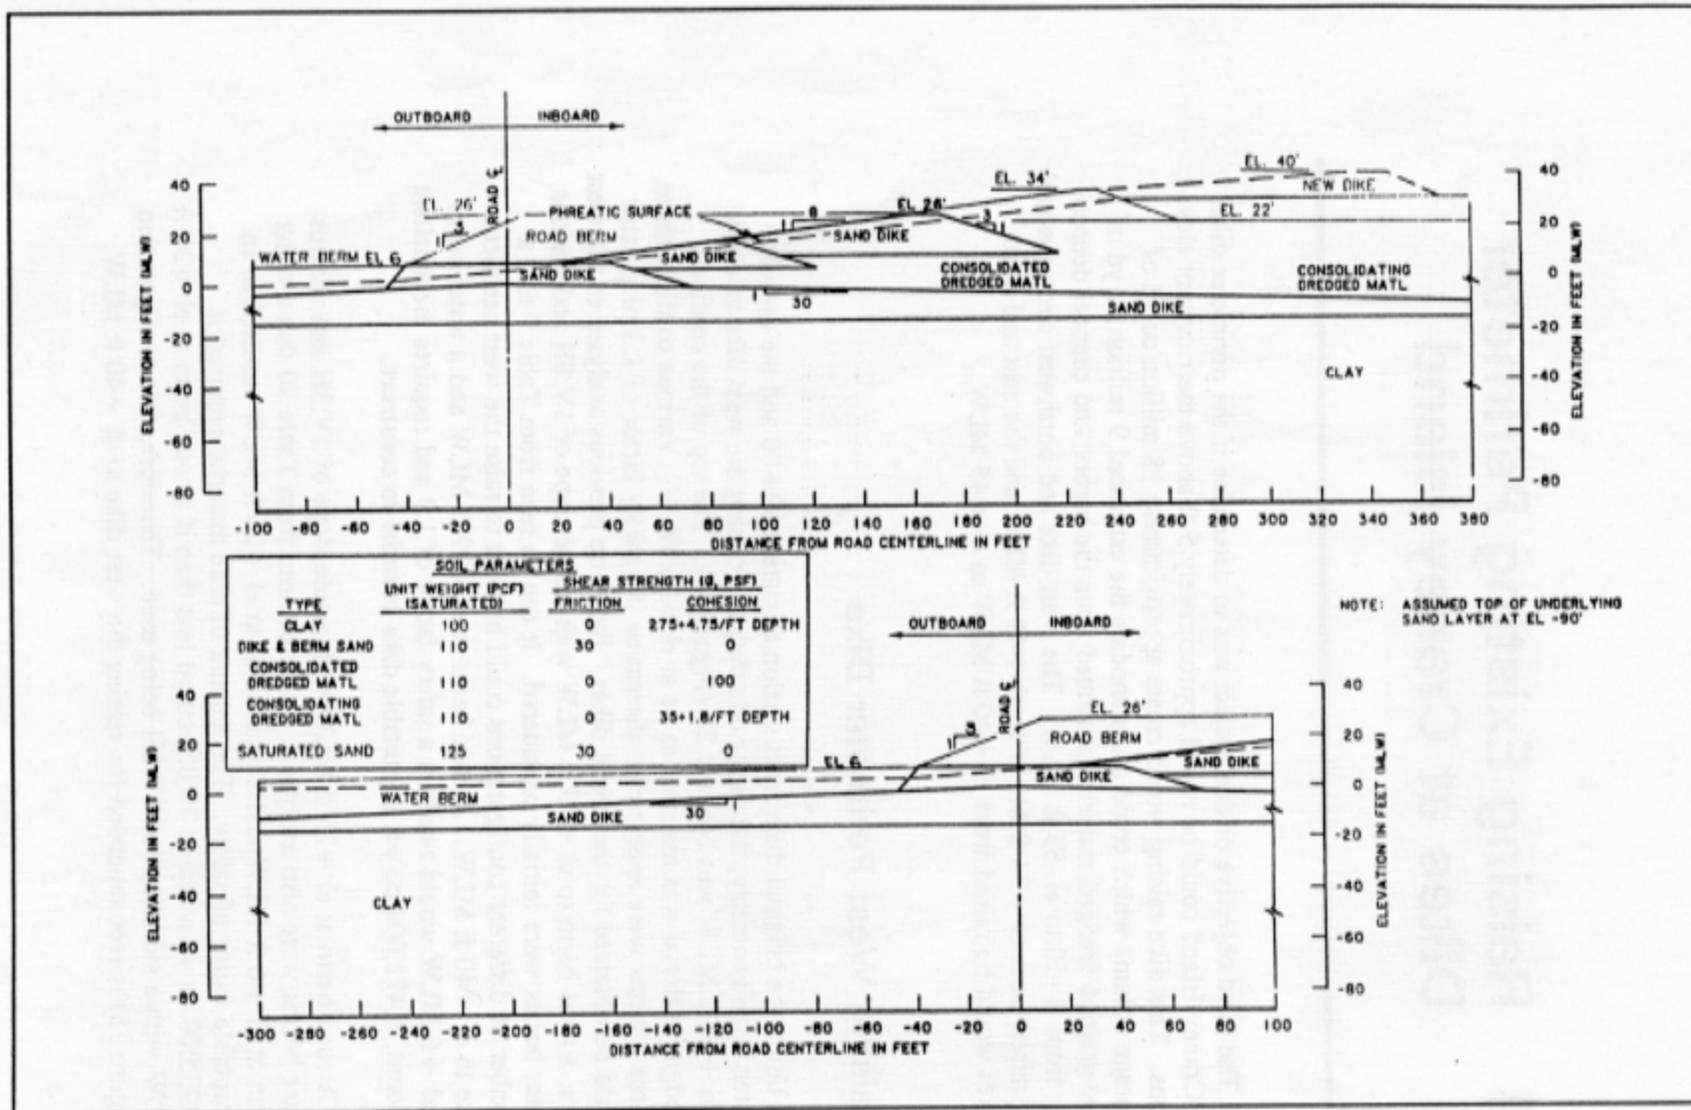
West perimeter dike cross-section raised to elevation +40 ft MLW
